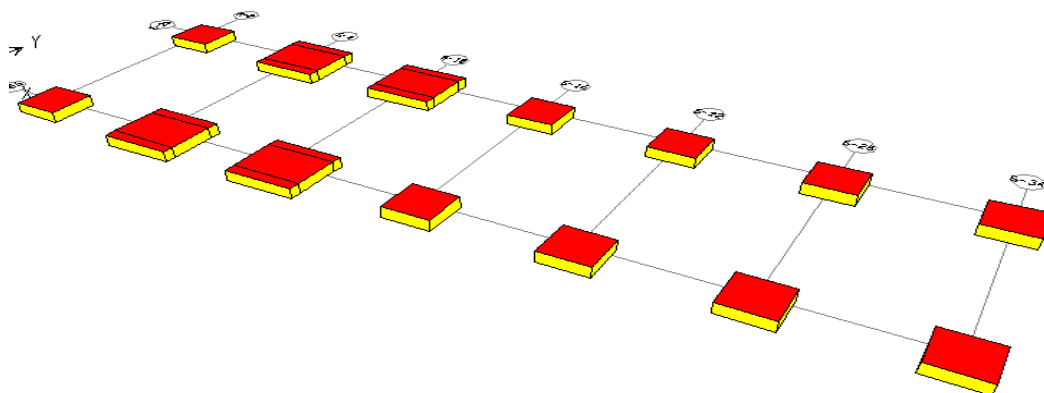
Pipe supporting structure foundation 3D model in SAFE
